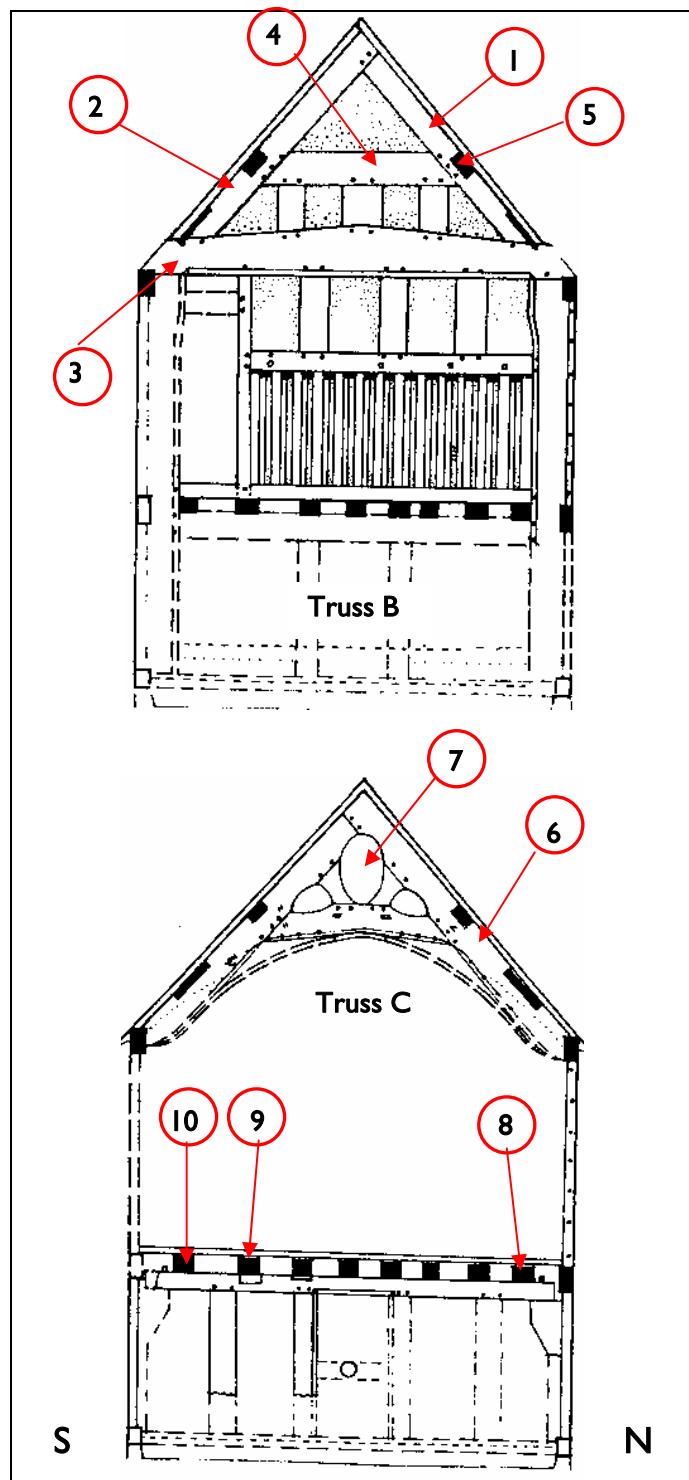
North cross-wing trusses (chapel and chapel chamber) to show timbers sampled (after Jones 1975–76)
